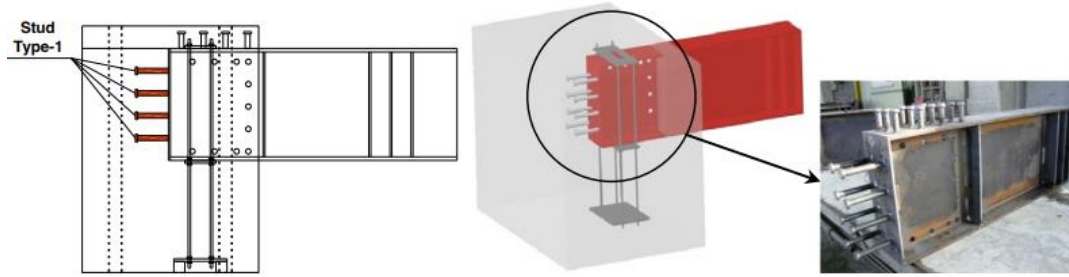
Joint with stud Type-1 (Proposed joint-1). (Kim, Yoon, Kim, Choi, & Ahn, 2011)
